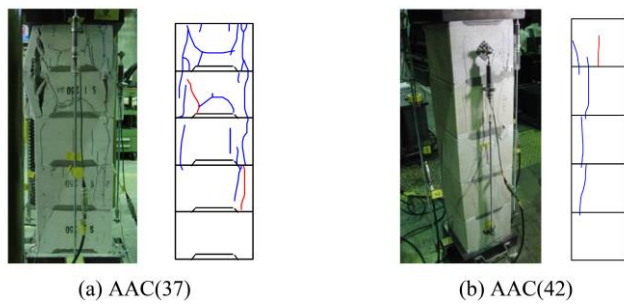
Final cracking patterns and pictures of the specimens at the end of compression test
